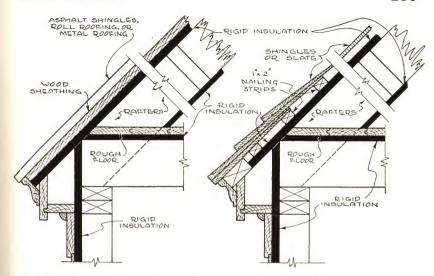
Section of a Cornice Showing How Rigid Insulation Can Be Used on Top of Rafters with Wood Sheathing or Nailing Strips over the Insulation
